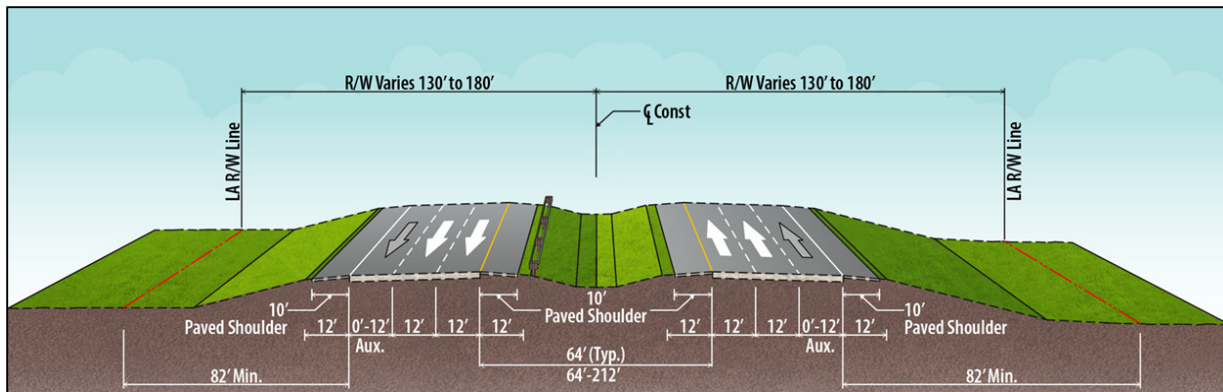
Existing I-275 Mainline Typical Section from south of 54th Avenue South to I-175 (Segment A)
